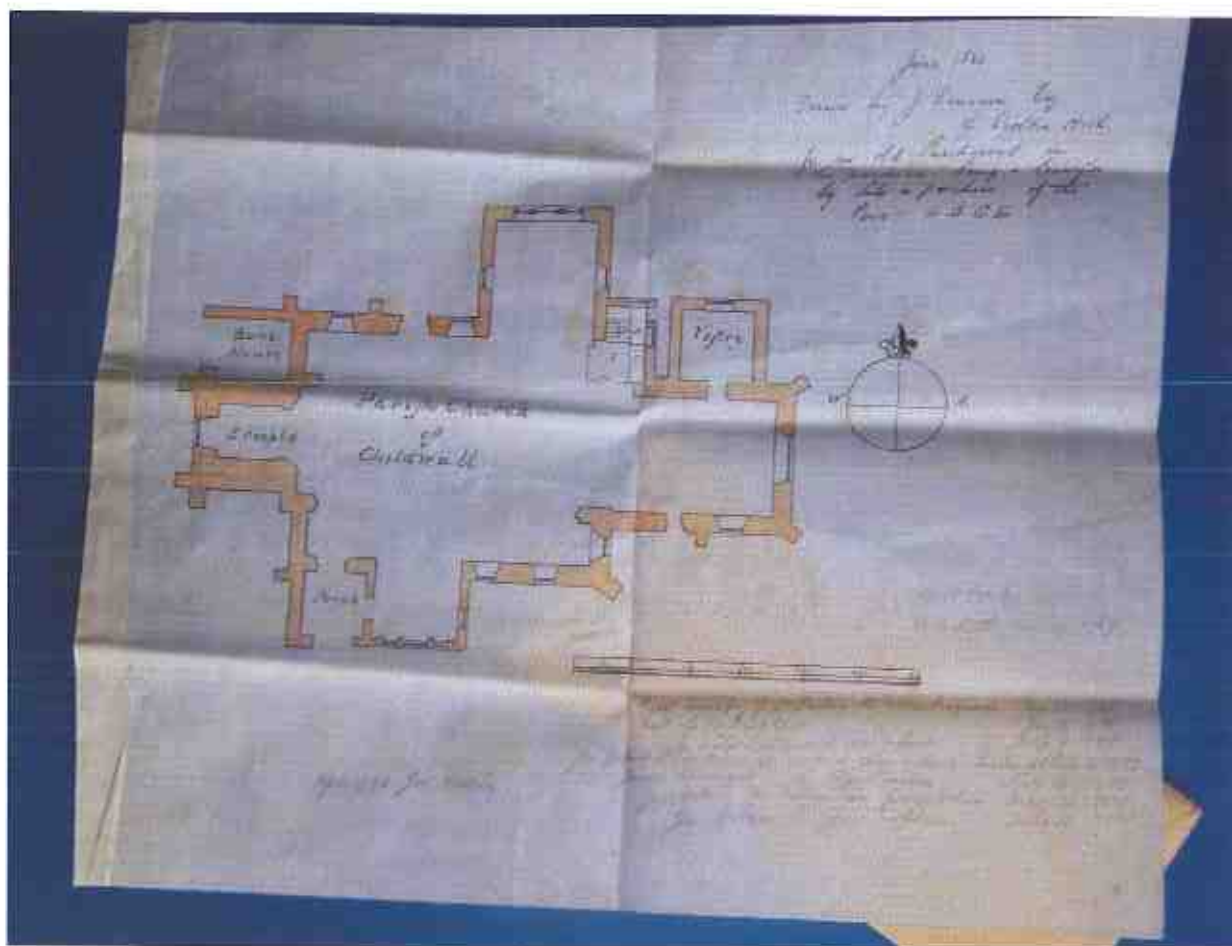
Plan of Childwall Church 1767 (tracing of 1853).
